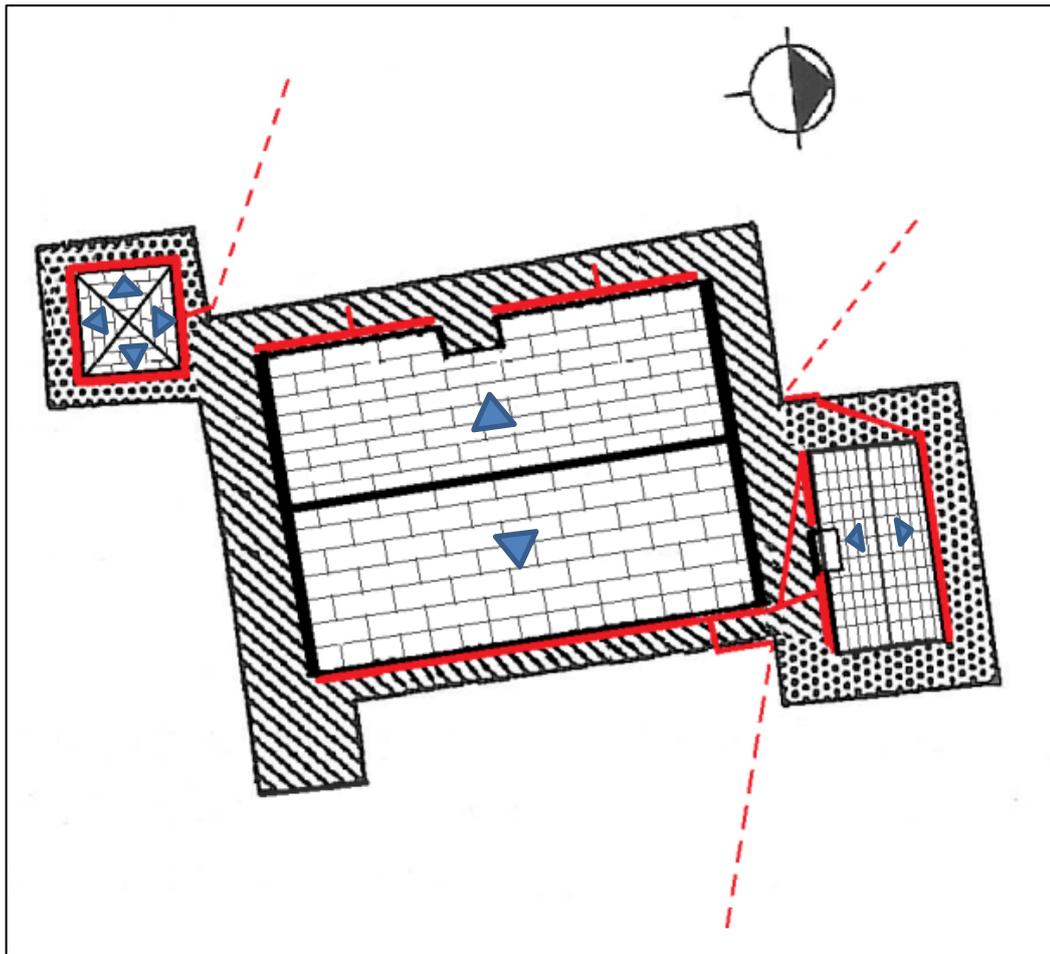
Rough plan view layout and schematic of new gutter/drainage system
